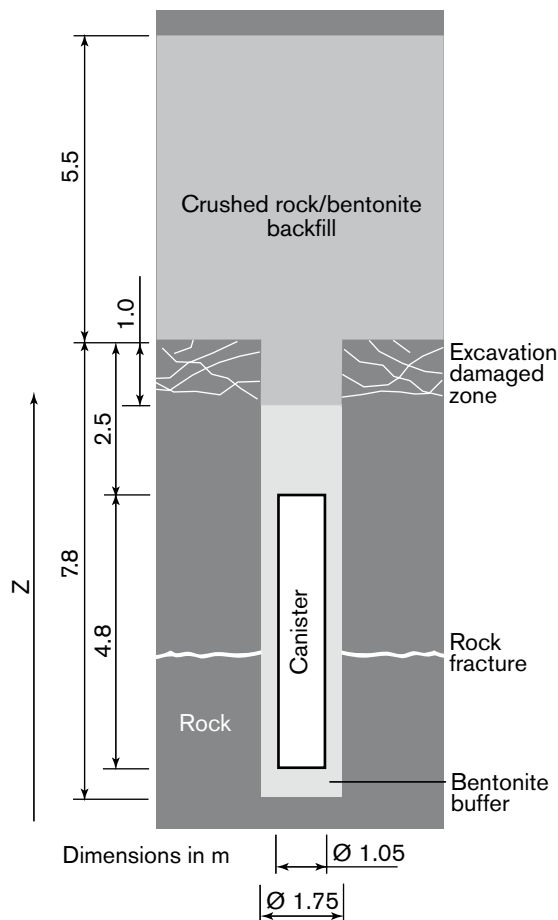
A canister is shown in a deposition hole with surrounding bentonite buffer.
